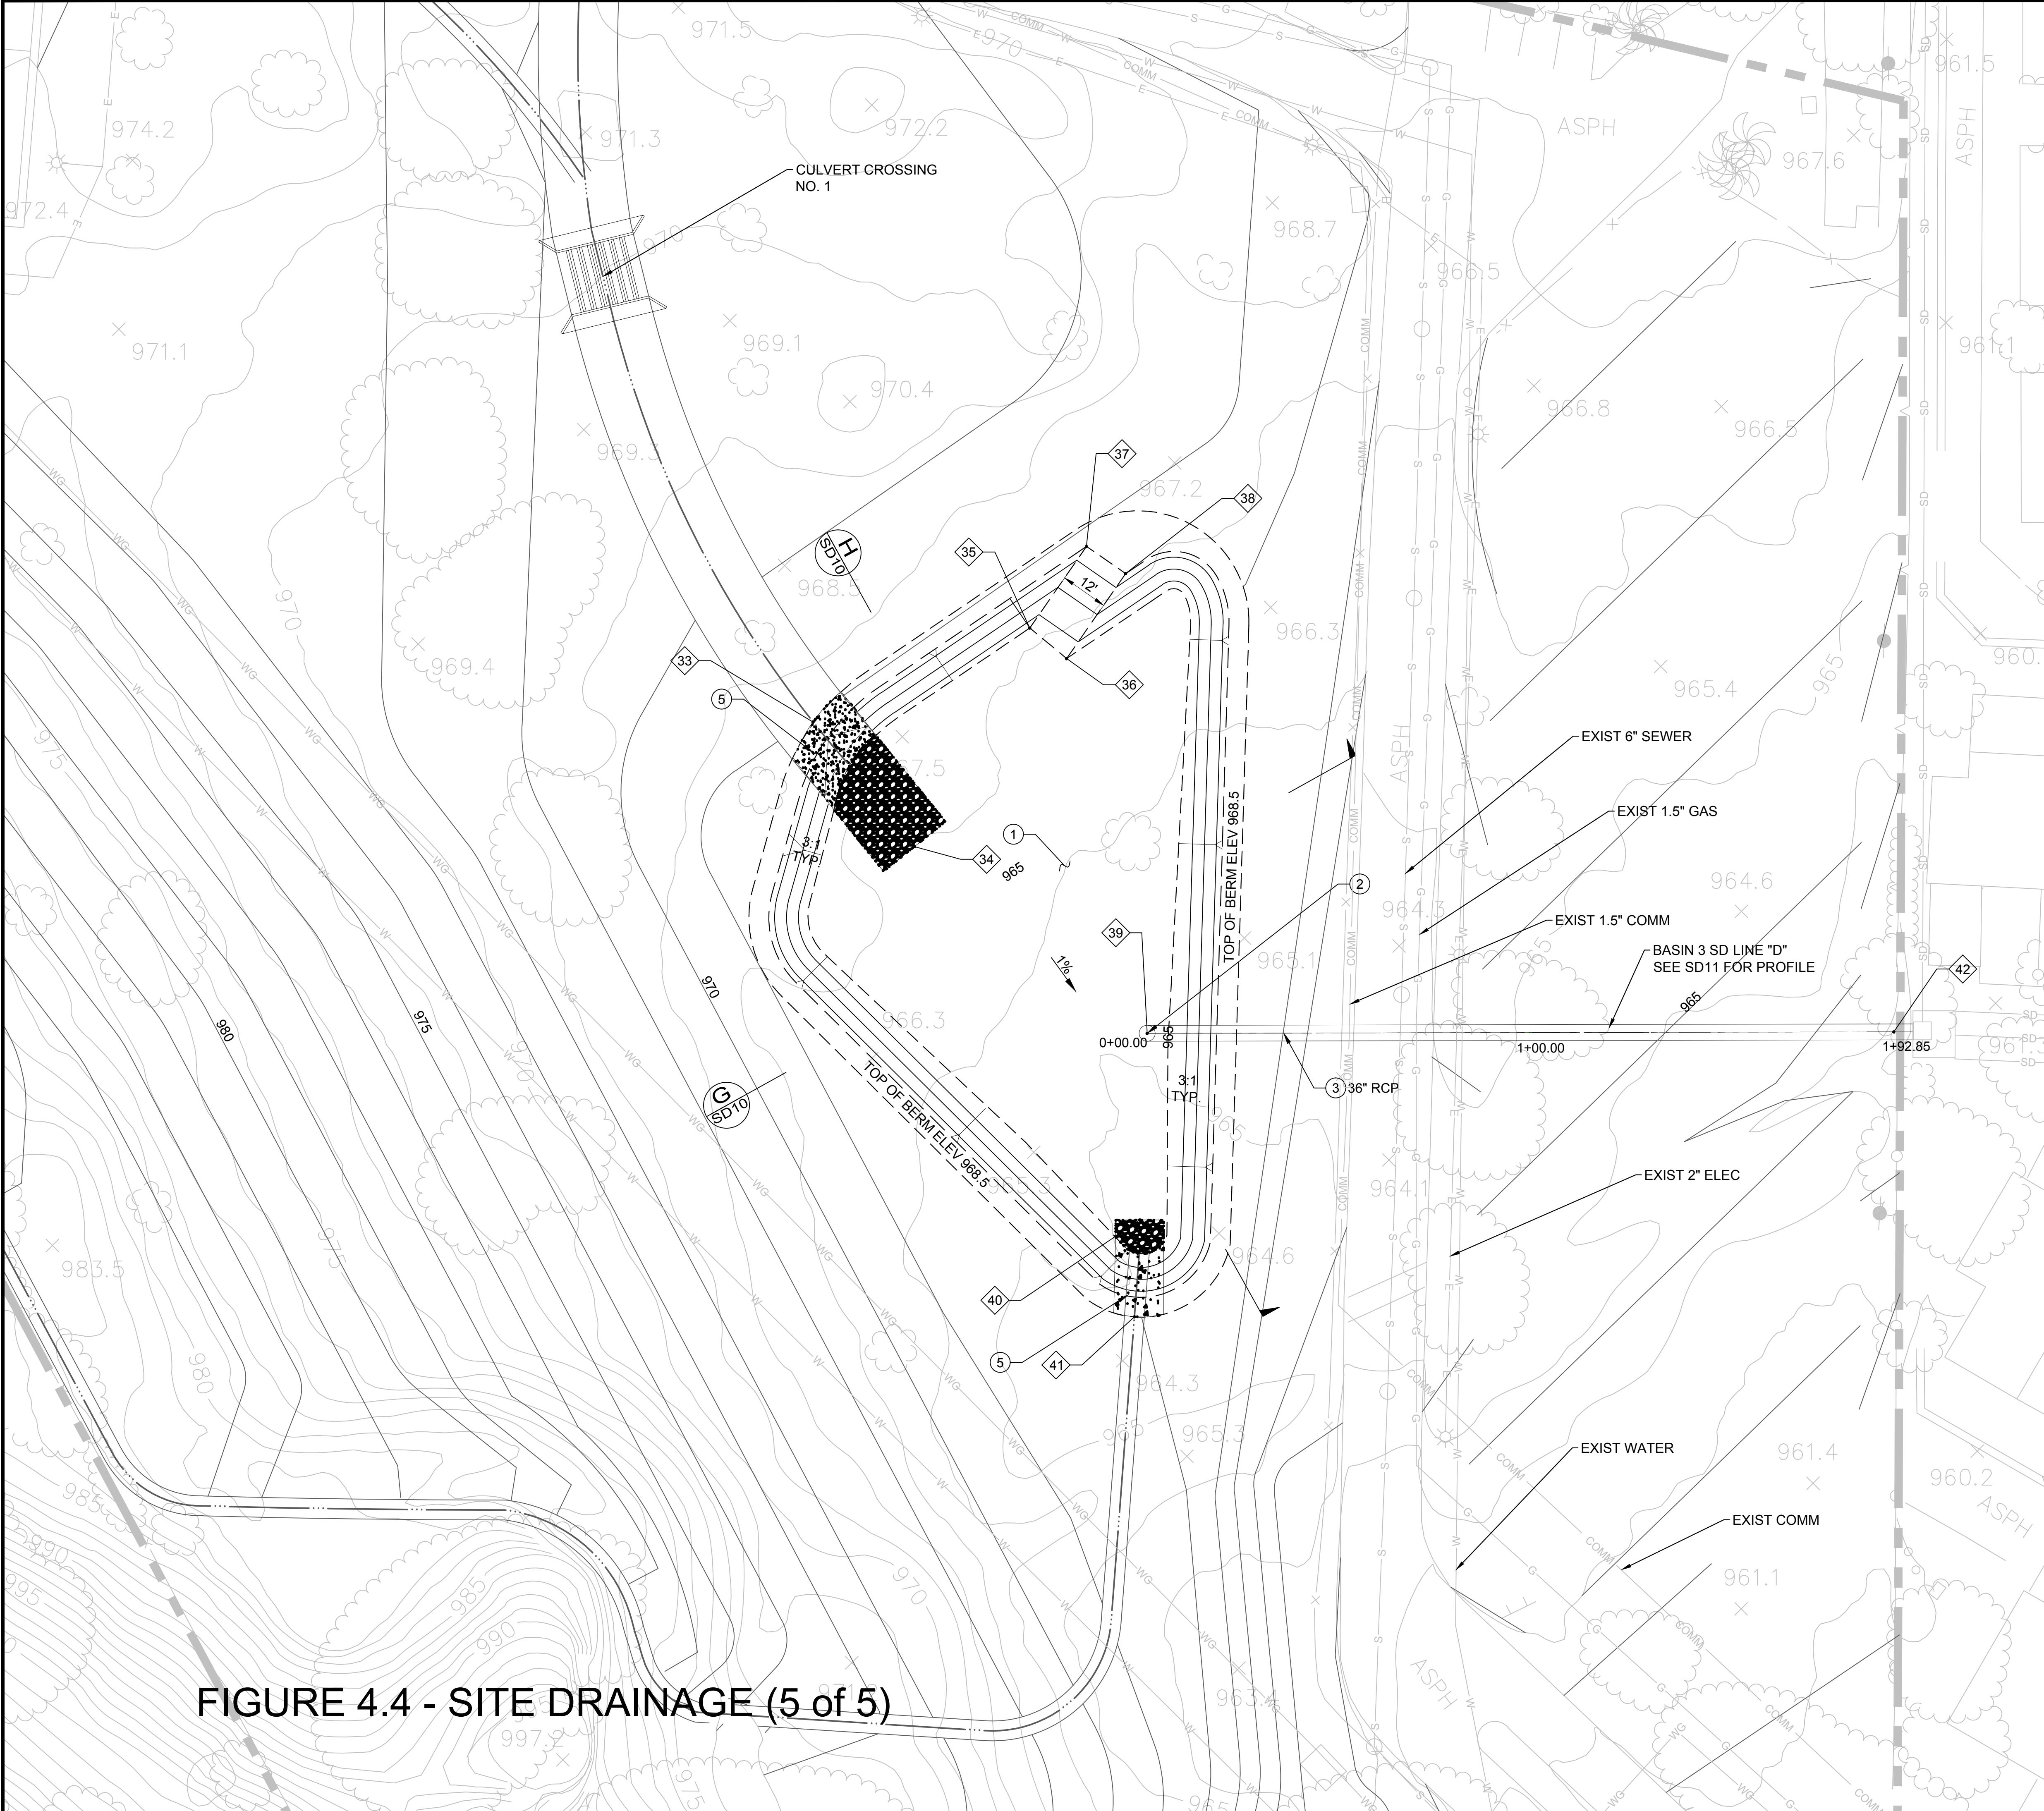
SITE DRAINAGE (5 of 5)
